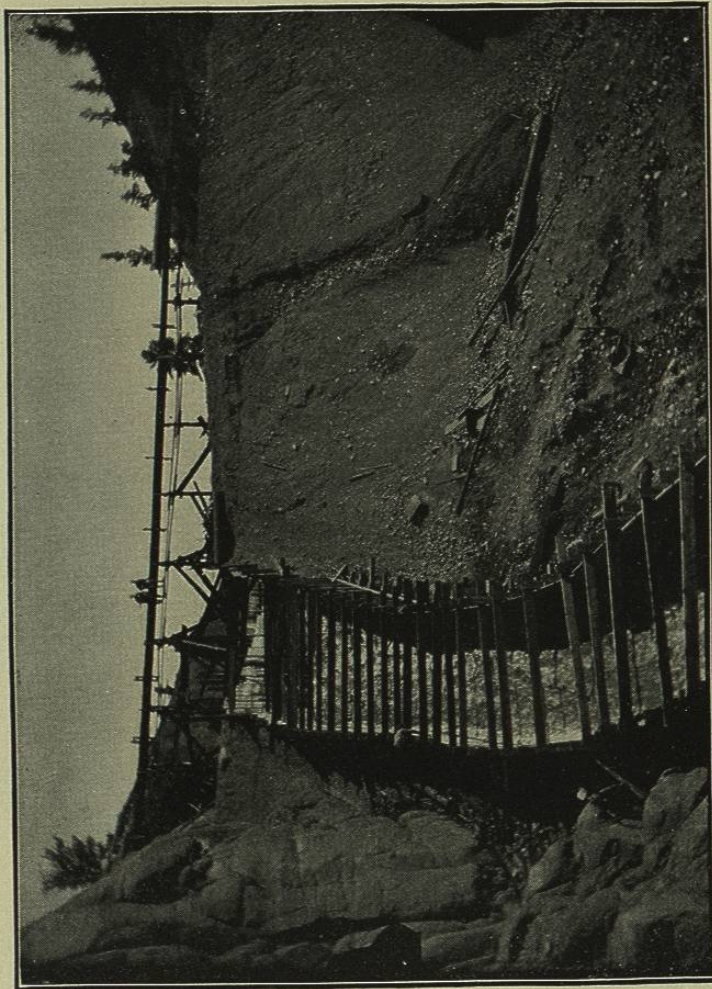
WASTEWAY FLUME FOR FLOOD DISCHARGE OVER LOWER SLOPE OF TERRACE DAM. SUMMER OF 1907.
